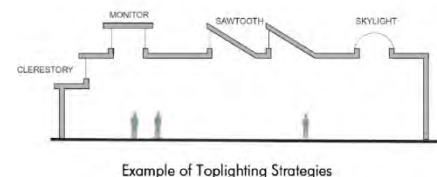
Roof openings can provide lighting where typical side lighting is restricted.
